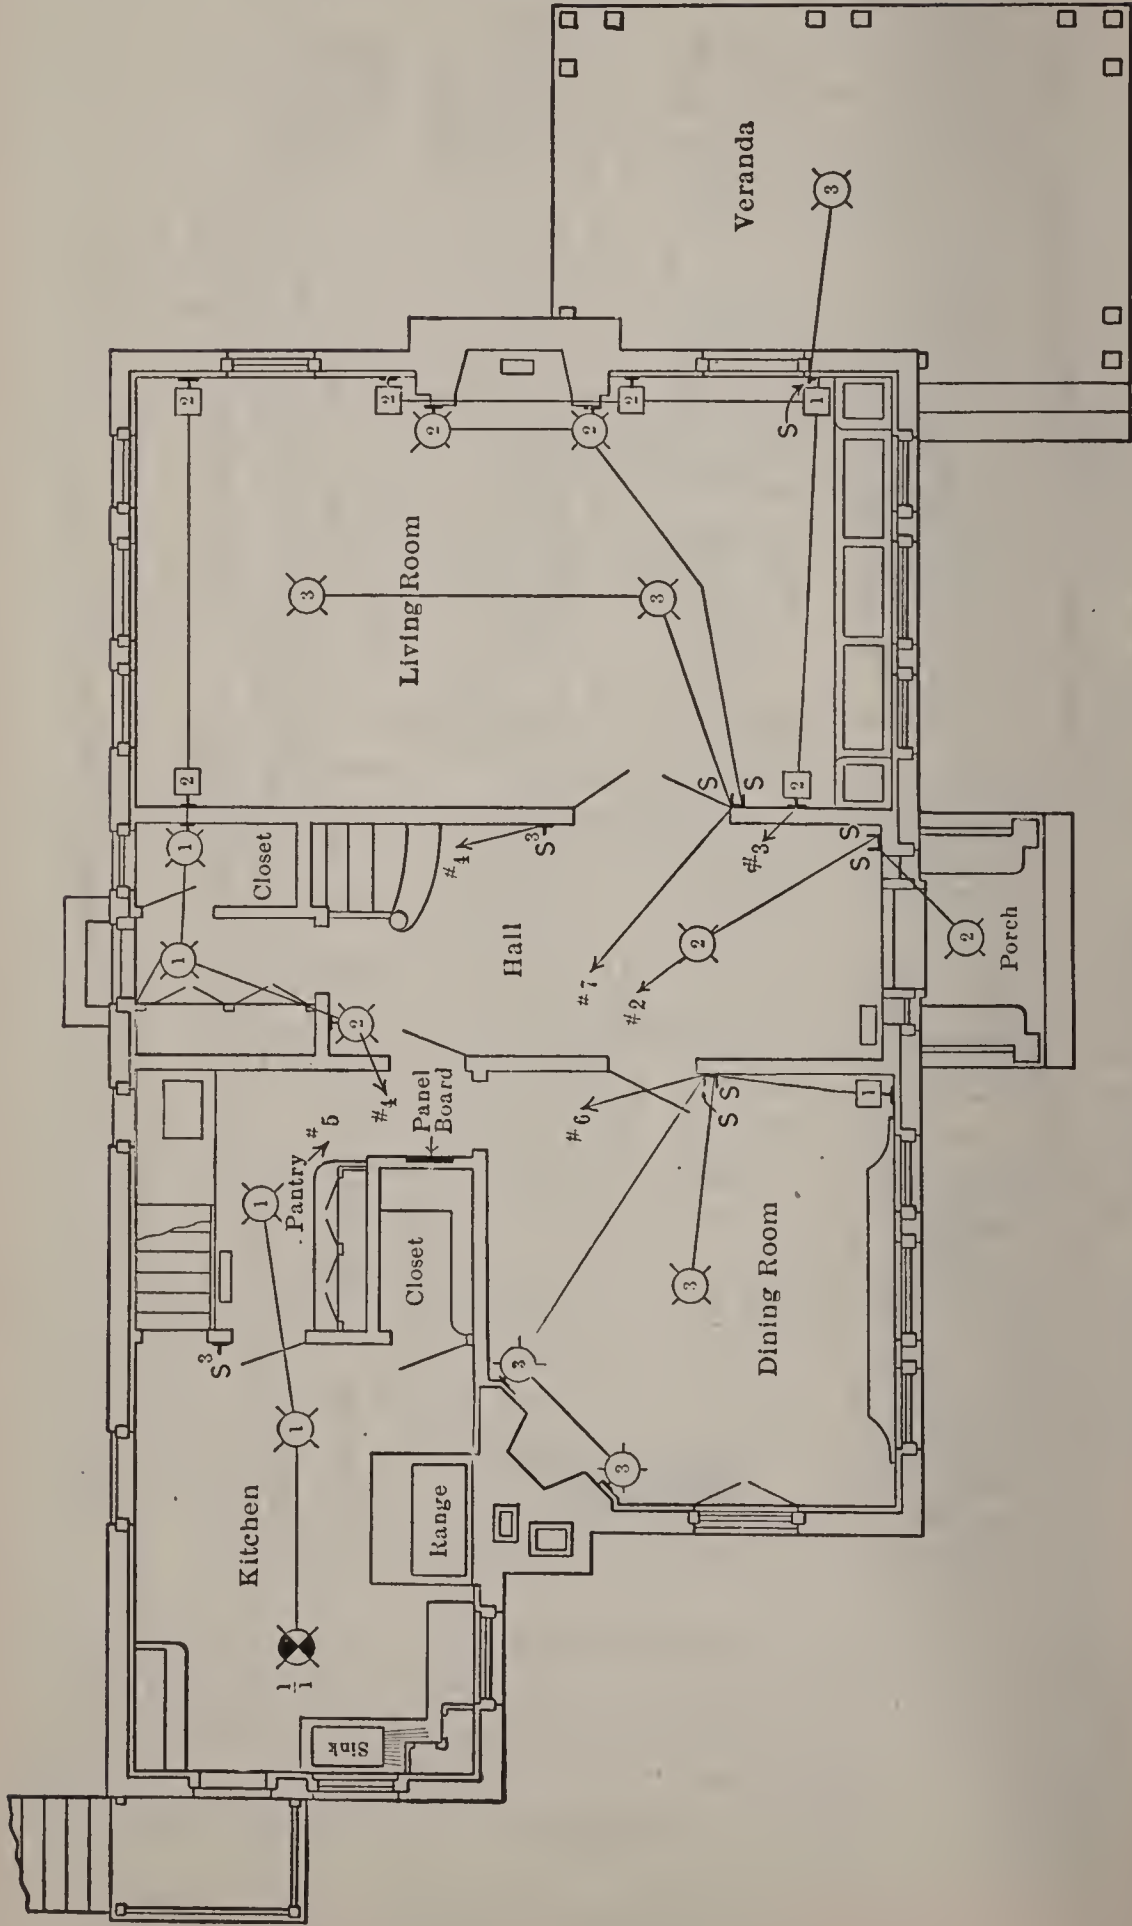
Lighting Installation for a Residence. First-floor plan.
